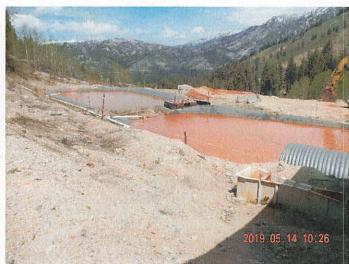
(DSCN1734) Description: Facing west, photo of Pond #2 (South Pond).
